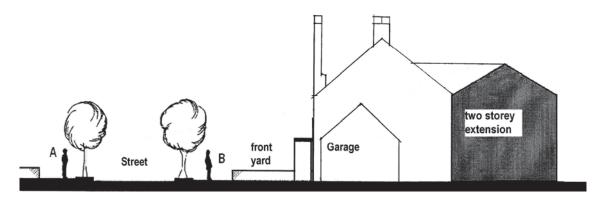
Side view of an acceptable two-storey addition to a two storey dwelling with the roof set lower than the main roof. If the new roof is visible it should be finished in Marseilles terracotta tiles to match the original roof.
